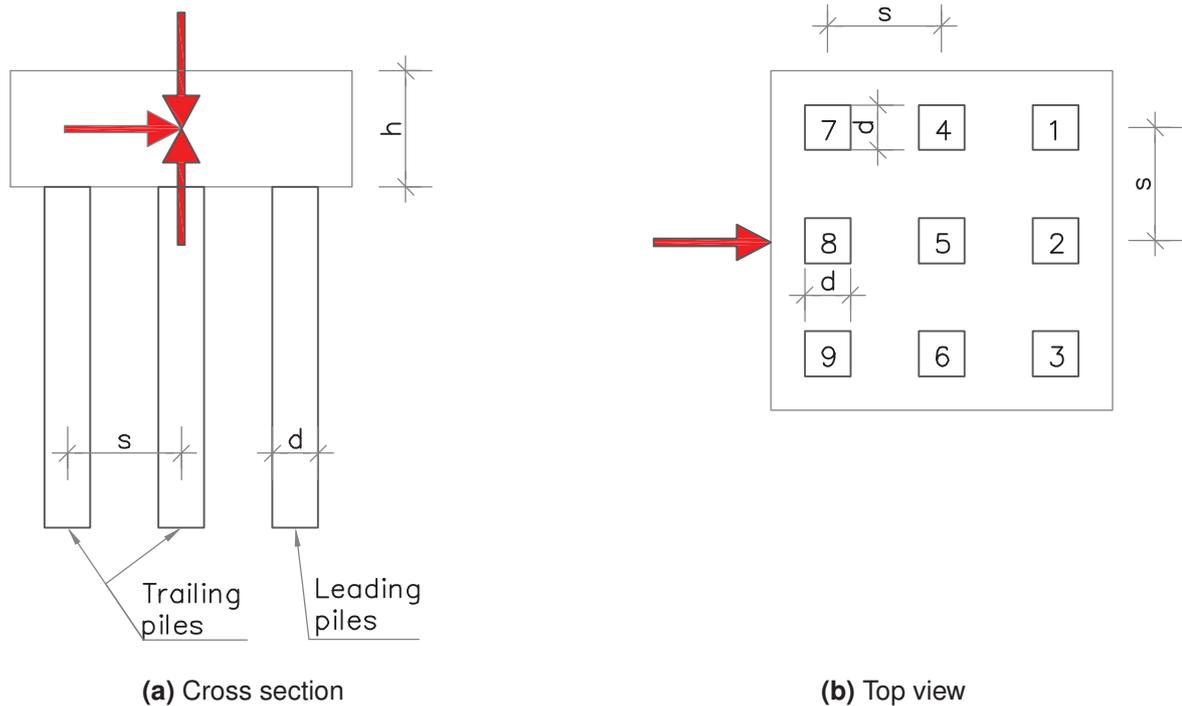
Schematization of the considered foundation construction, see table 5-1 for classification of the different piles
